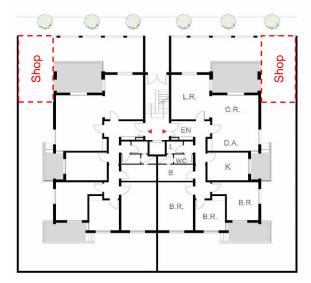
Retail shops built in the garden of a residential building Source: Site survey, 2017
